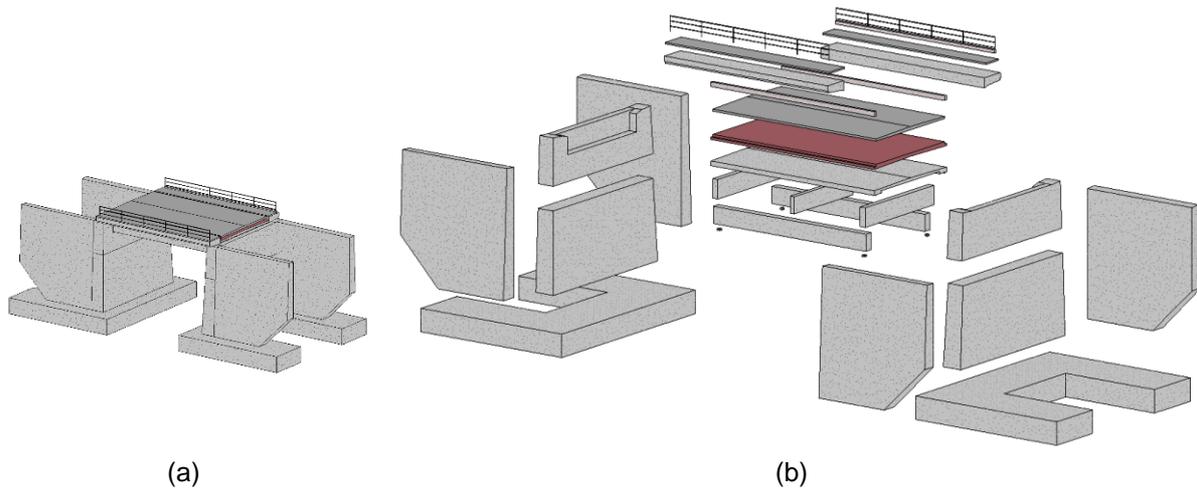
Remodelled exemplary BrIM: (a) collapsed, and (b) exploded view
